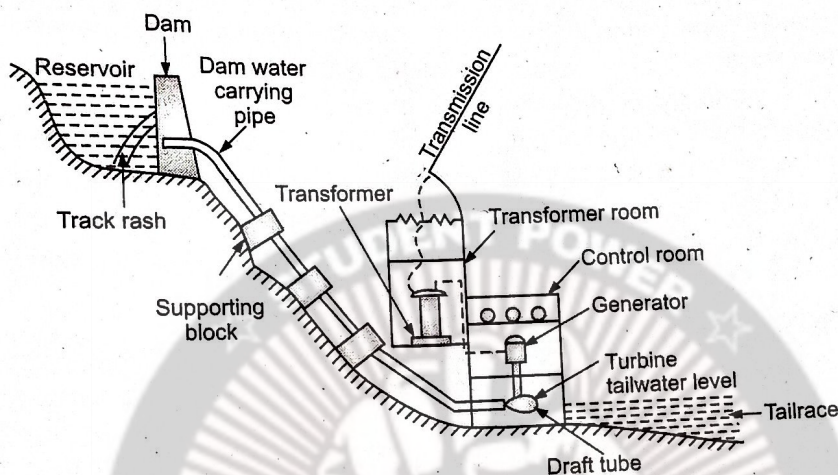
General arrangement of hydroelectric power plant in elevation
